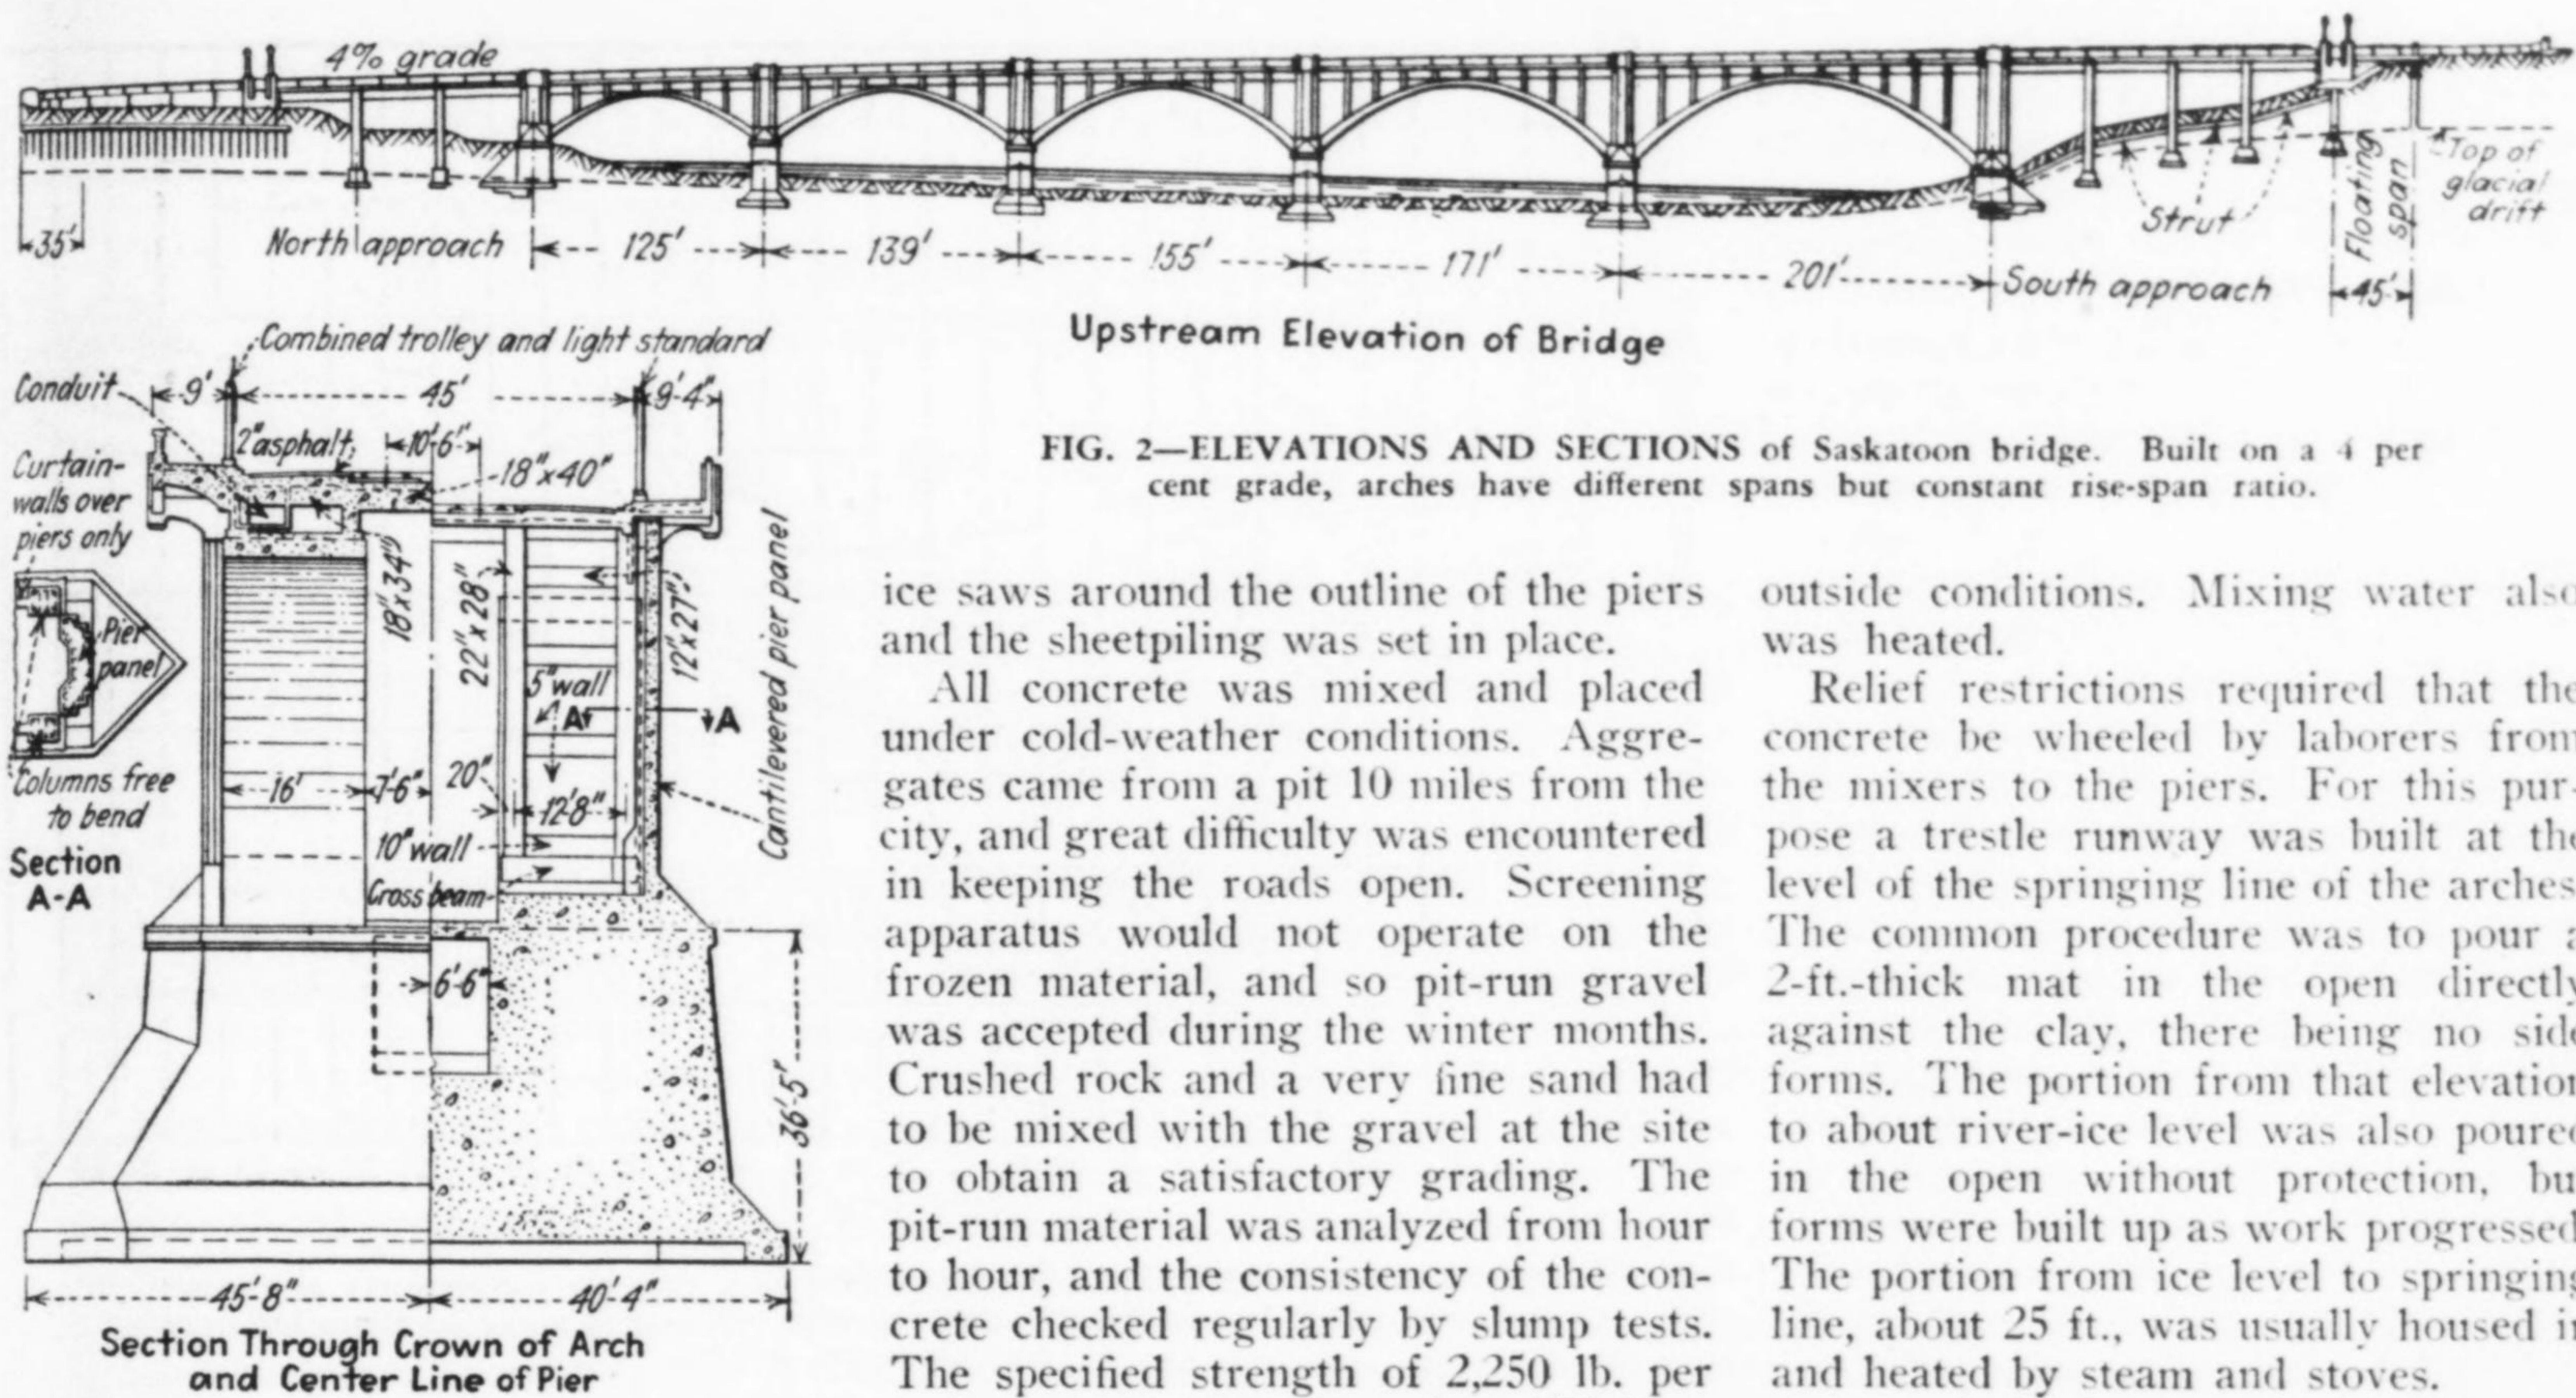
ELEVATIONS AND SECTIONS of Saskatoon bridge. Built on a 4 per cent grade, arches have different spans but constant rise-span ratio.
